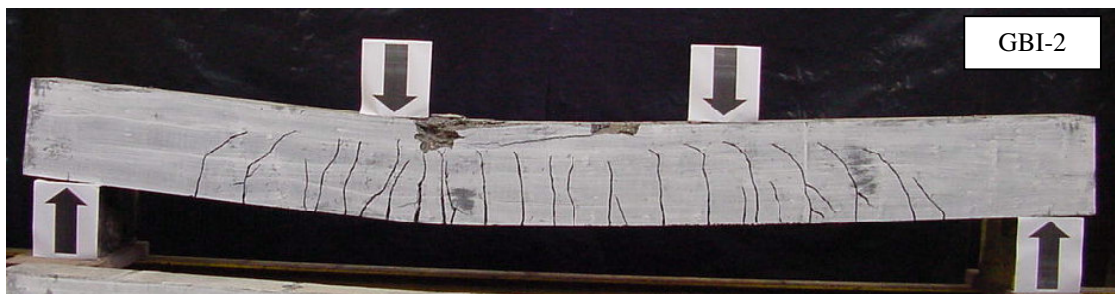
Crack Patterns and Failure Mode of Test Beams
